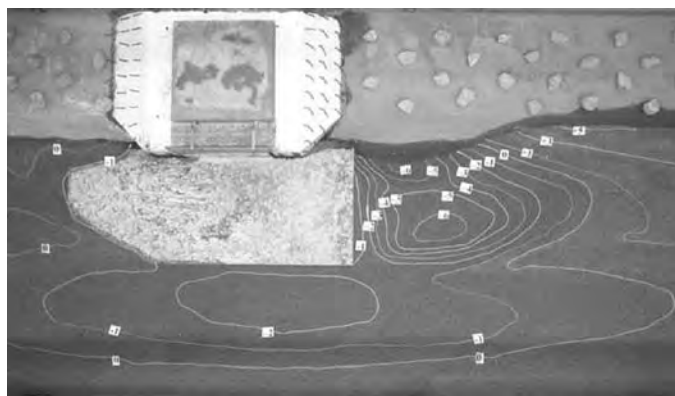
Scour contour of Test T6 with a collar attached along the abutment (collar width is 350 mm, collar elevation is 10 mm below the original bed, flow is from left to right).
